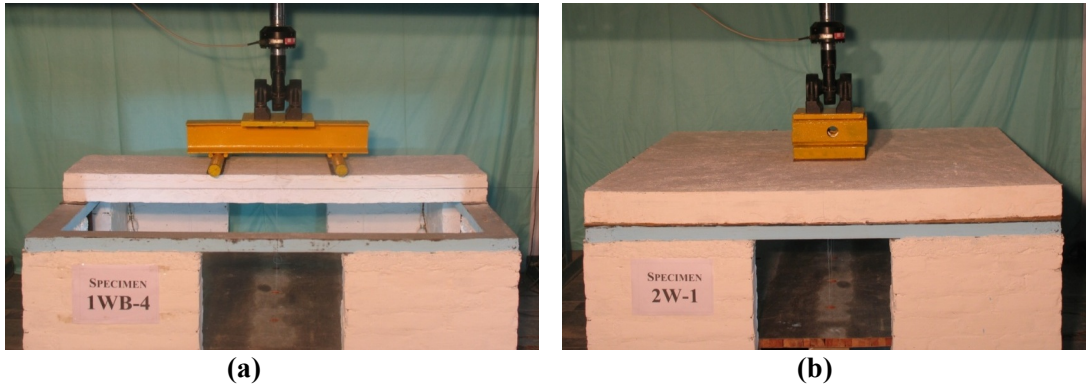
(a) Three span loading for the one-way slabs (b) Patch loading for the two-way slabs
